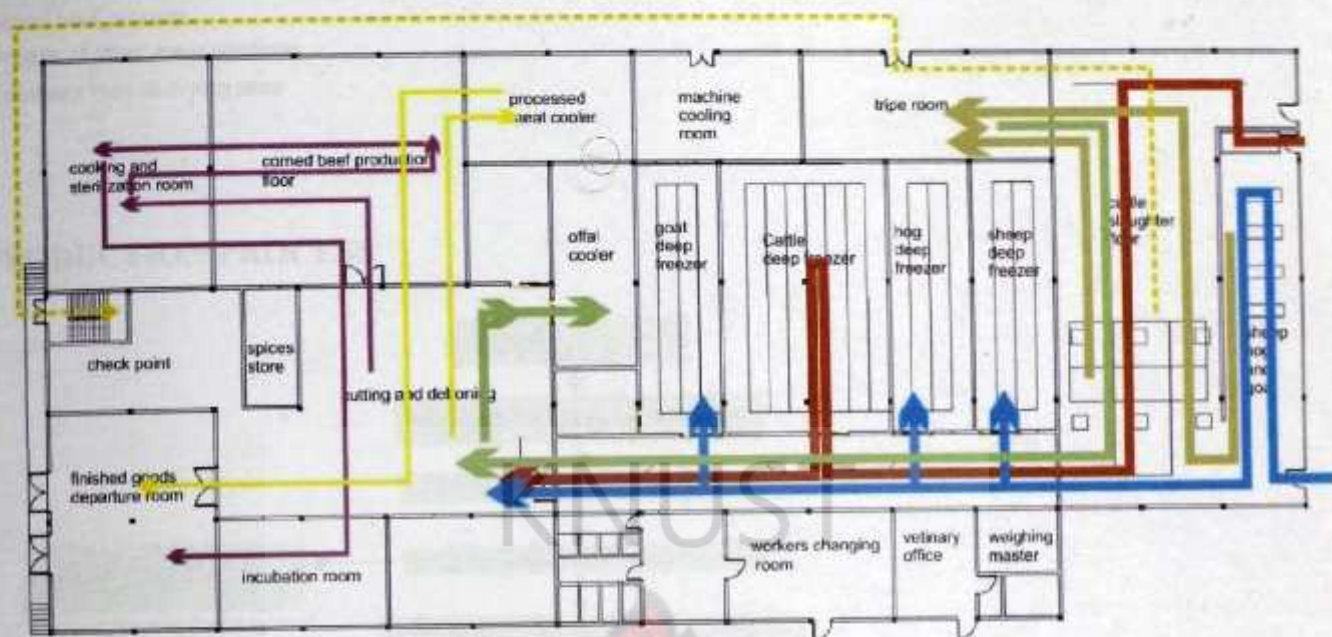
Ground floor plan (Source: Bolgatanga meat factory) – (Existing)
